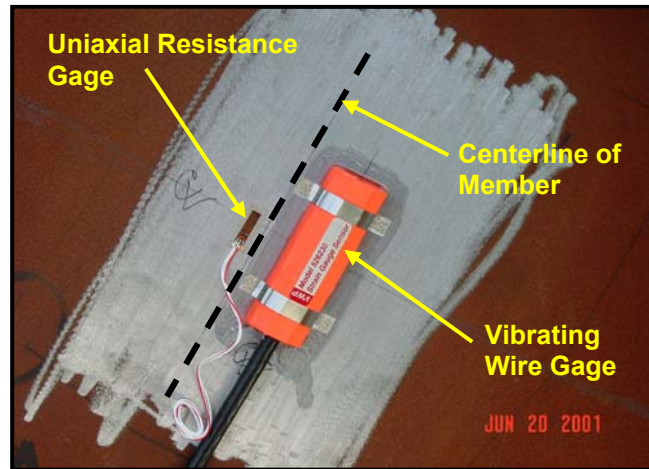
Typical strain gage at each location on the structural steel (DW2021WW)
